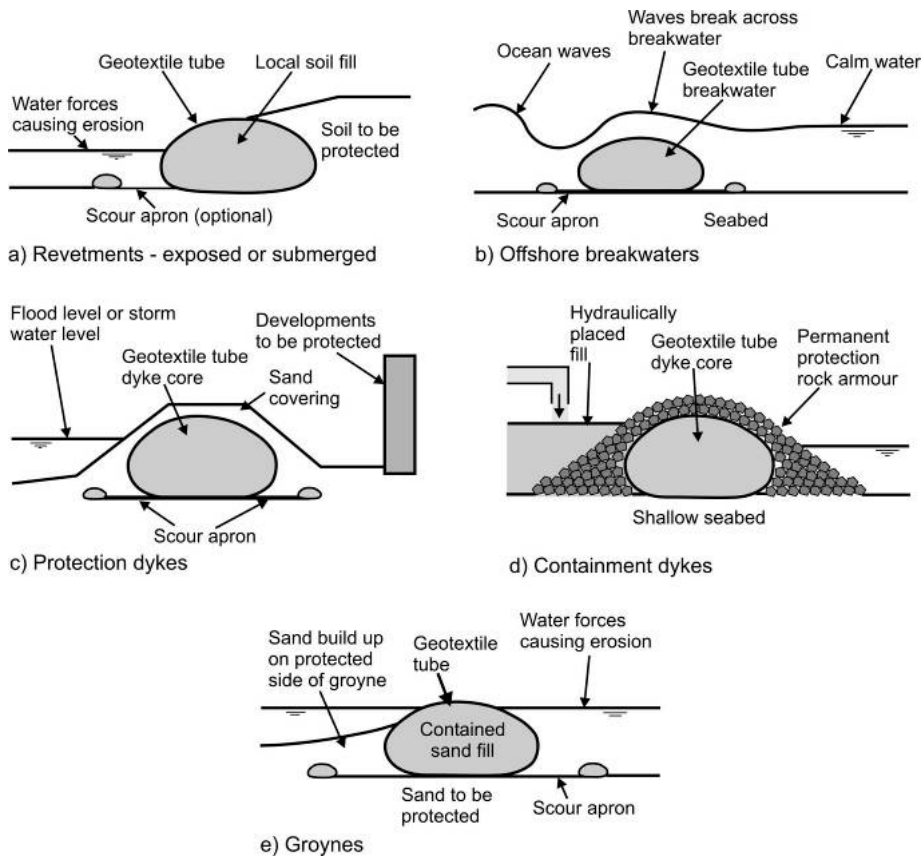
Geotube applications, source: Pilarczyk, (2000)
